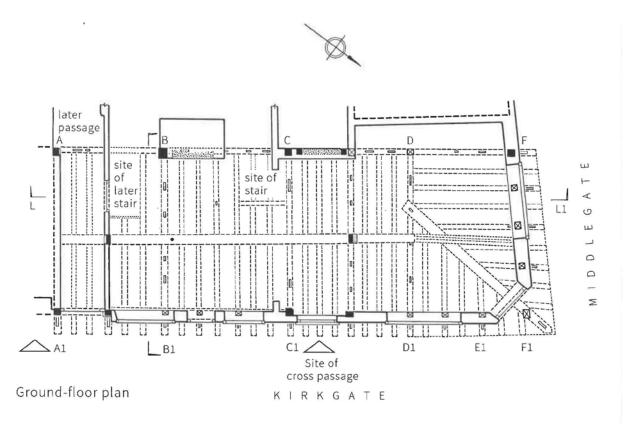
Ground-floor plan of 22-24 Kirk Gate. [© HEA XA00314.]
